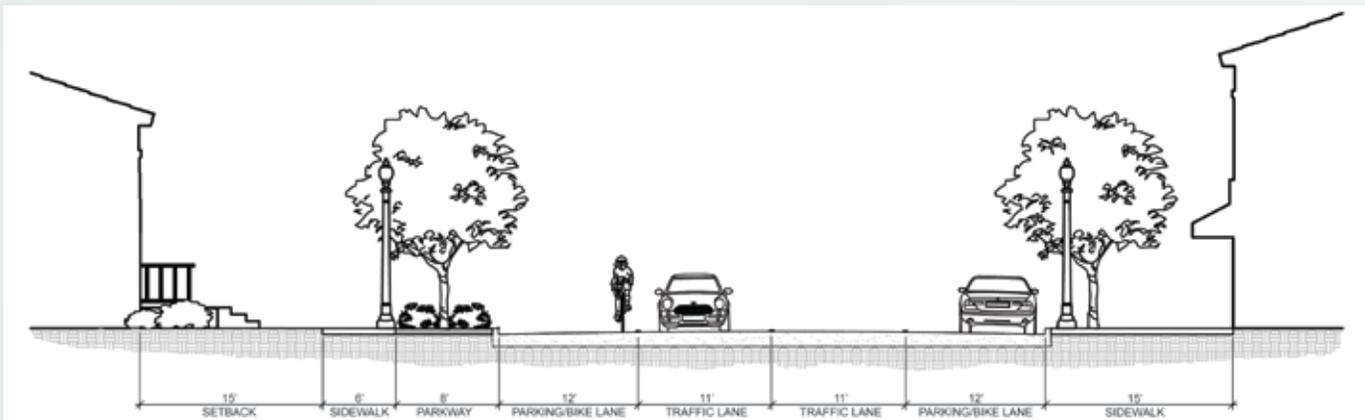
Proposed cross section of 6th Street from Orange Avenue to Main Street
